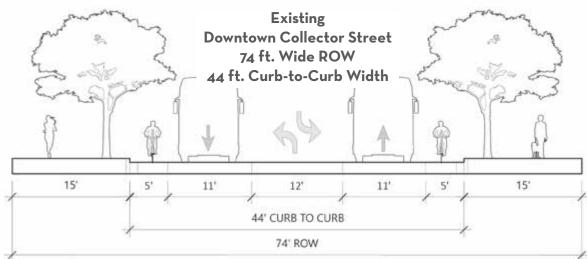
Existing: Typical Downtown Collector Street with a 74 ft. wide ROW and 44 ft. wide curb-to-curb. See Chapter 8D-1 Roadway Reconfigurations for minimum travel lane widths.
